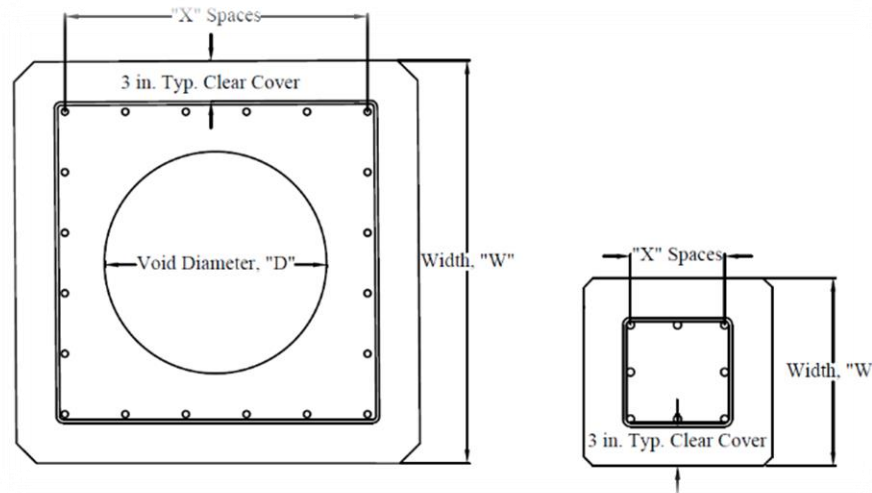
Typical ALDOT Voided and Non-Voided PPCP Cross Sections
